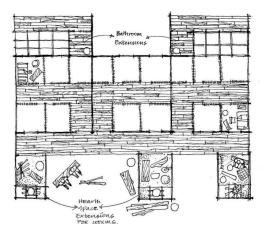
Plan showing modified IDP camp dwelling with hearth and bathing space extensions
